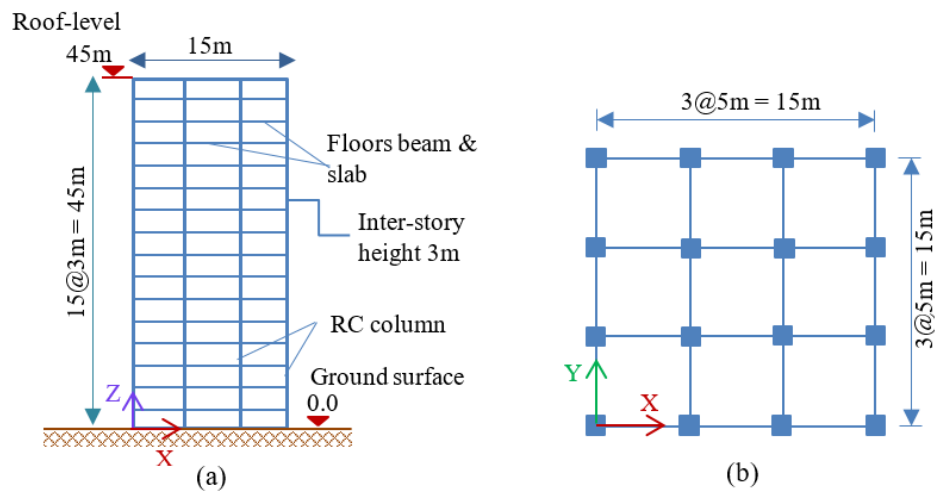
The layout of the fifteen-story RC-MRF building adopted in the study: (a) superstructure elevation view, and (b) standard floor plan of the building.
